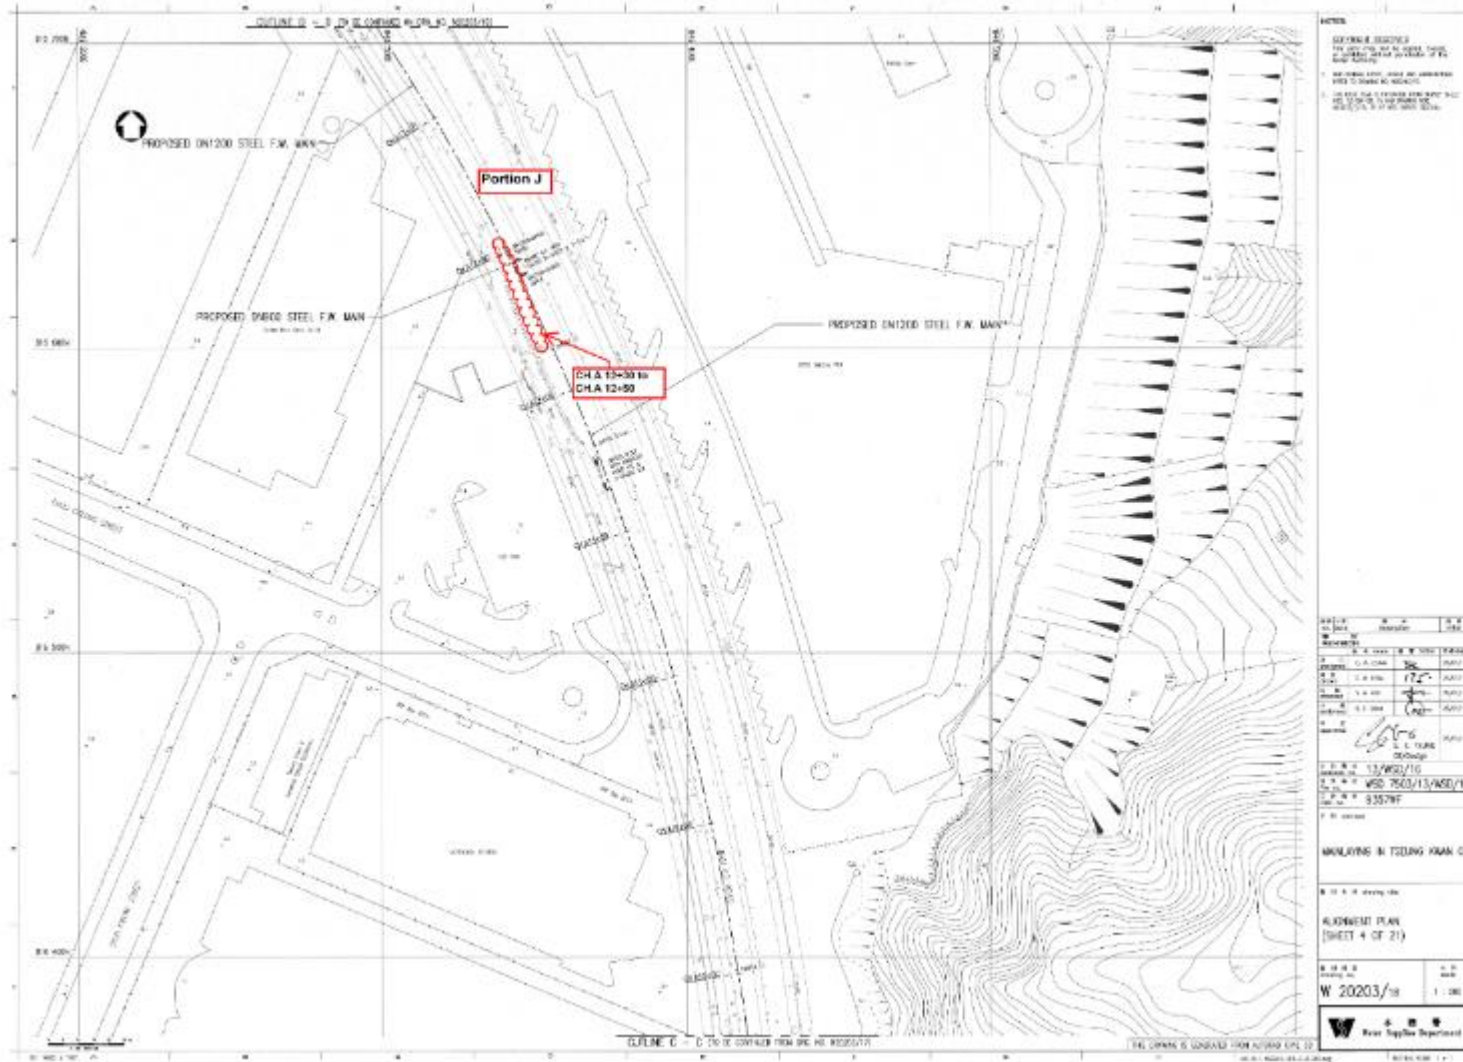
Location Plan for Portion J - CH.A 12+30 to CH.A 12+50
